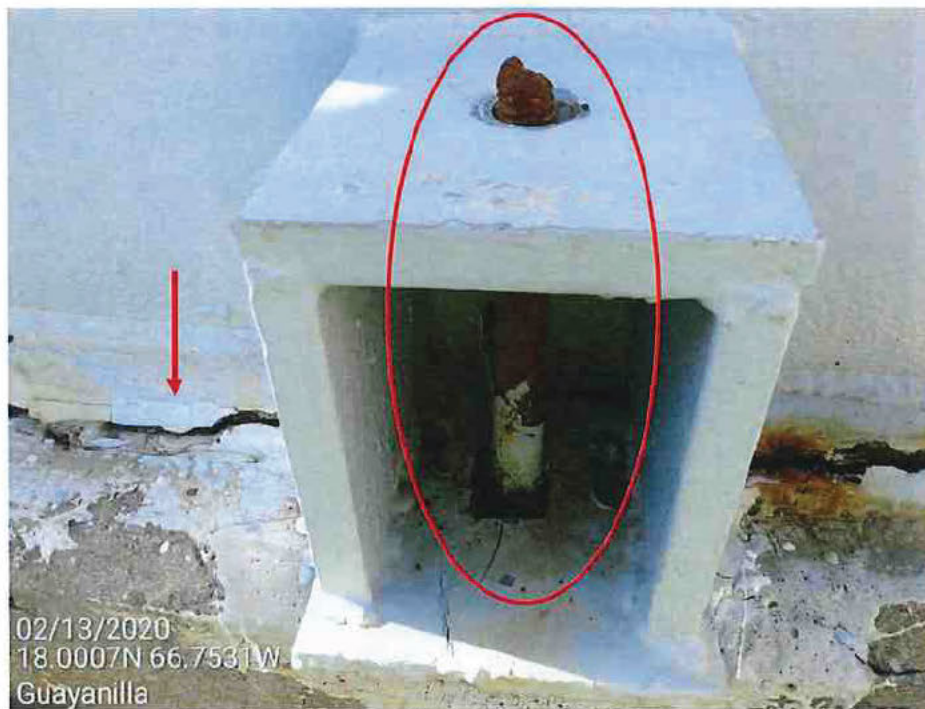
Tank bottom seal joint cracked and lift from base. Anchor bolt nut and concrete around anchor bolt ripped off, due to seismic overturning moment.
